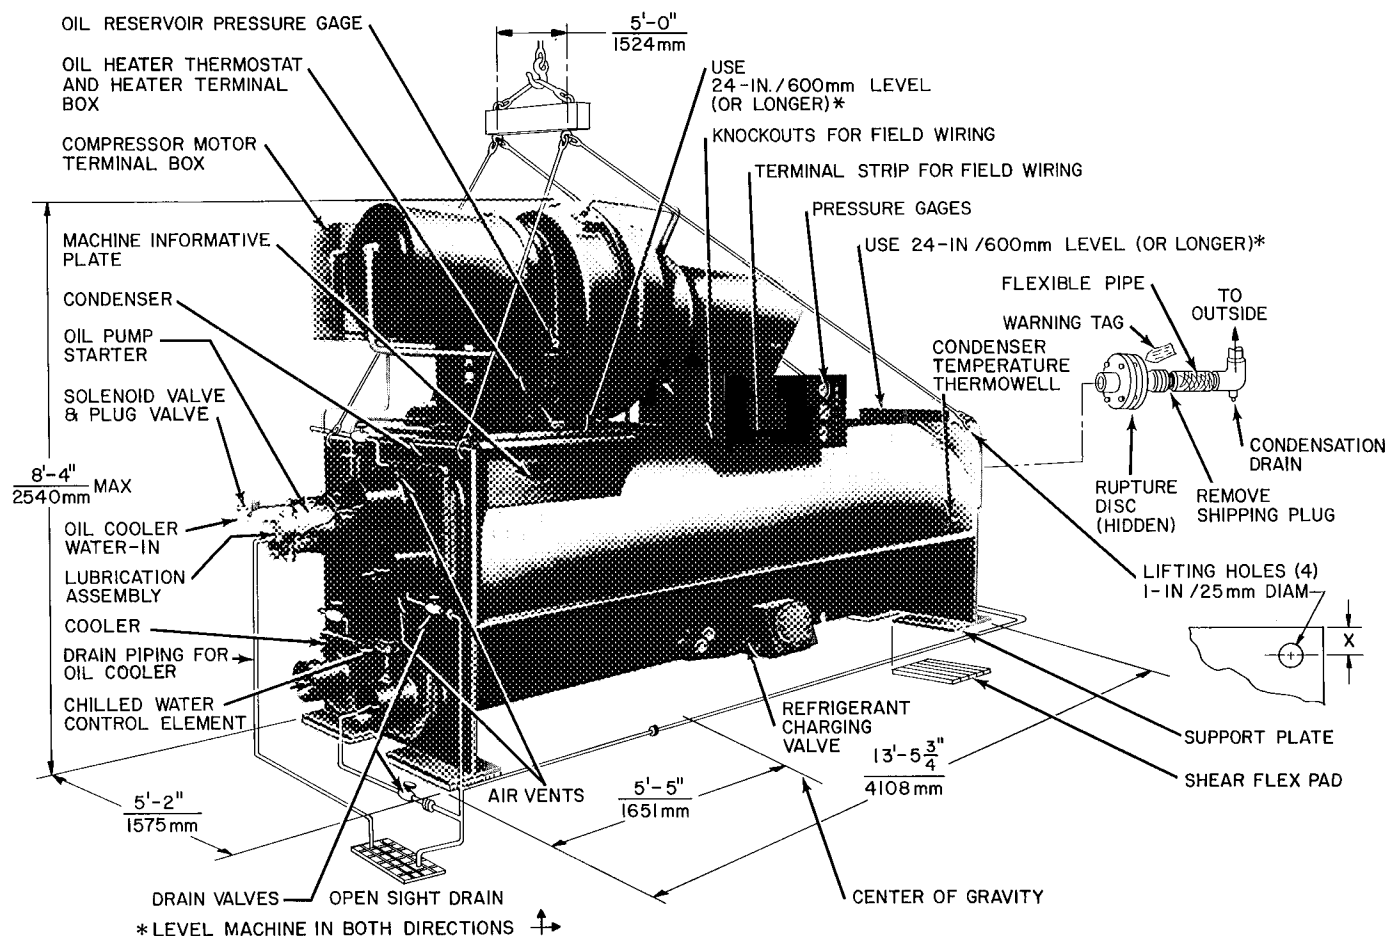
Typical Installation (100 thru 475 Tons/352 thru 1670 Kw)
